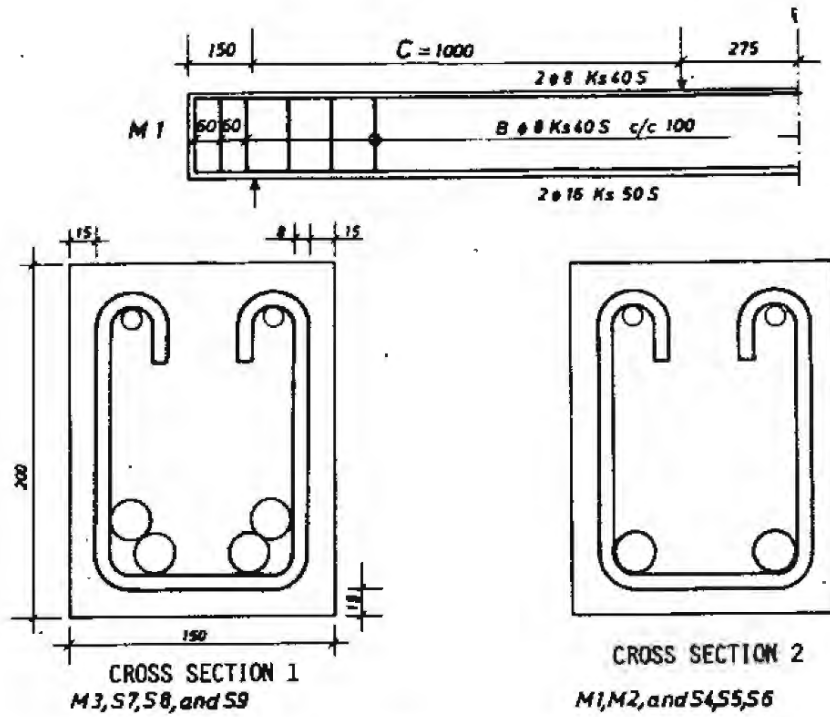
Cross section of beams with reinforcement and typical arrangement of loads. (Cfr Table 2.2 and 2.3 for further specifications).
